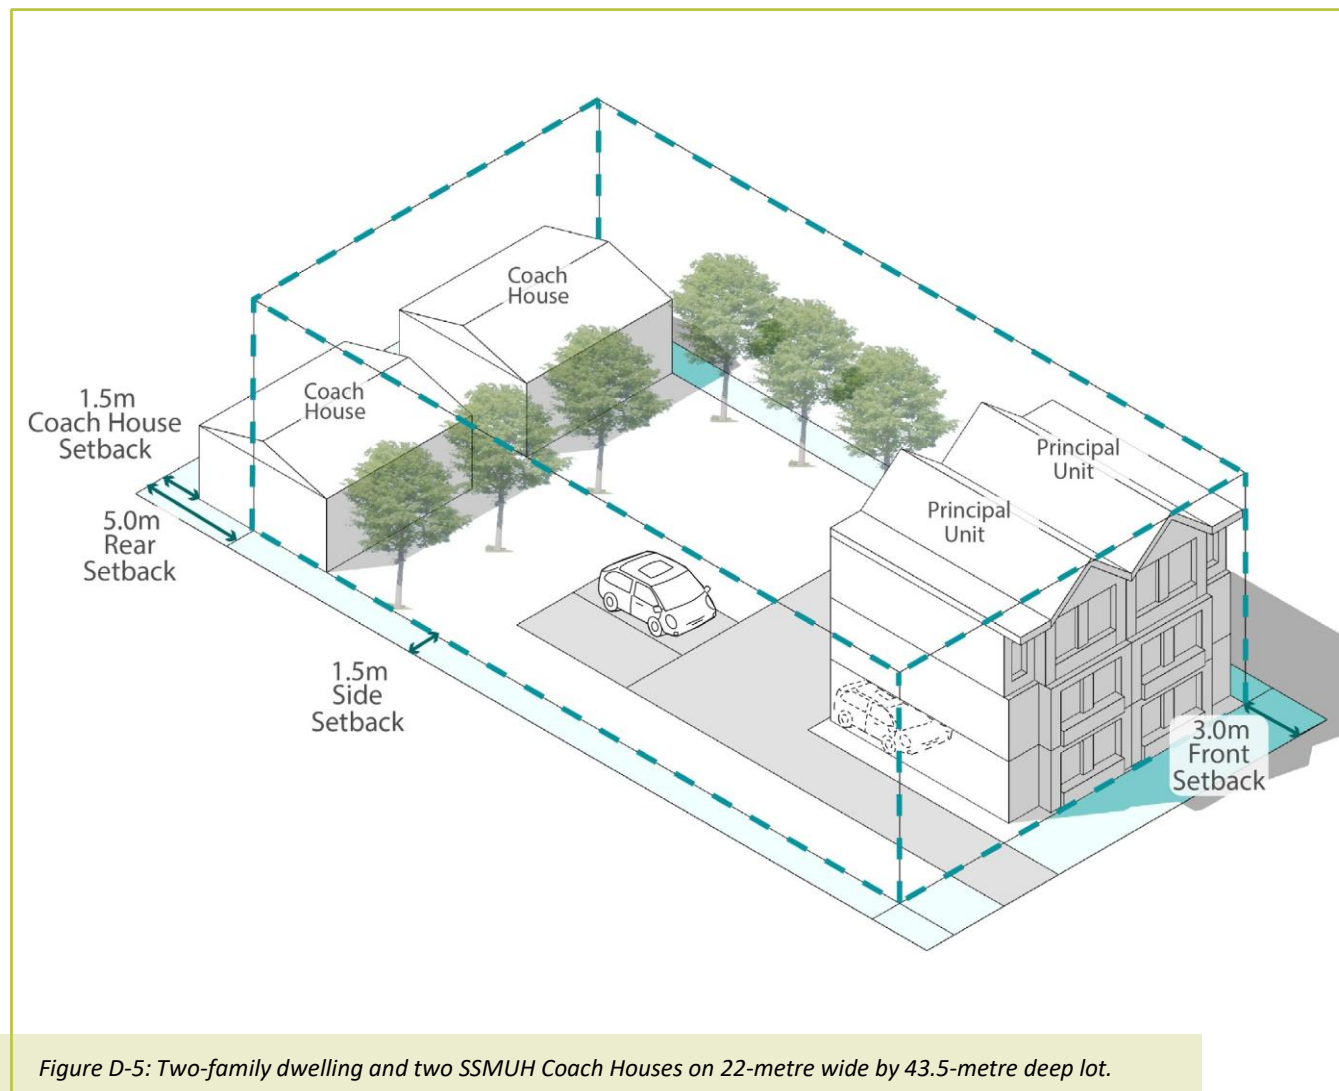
Two-family dwelling and two SSMUH Coach Houses on 22-metre wide by 43.5-metre deep lot.
